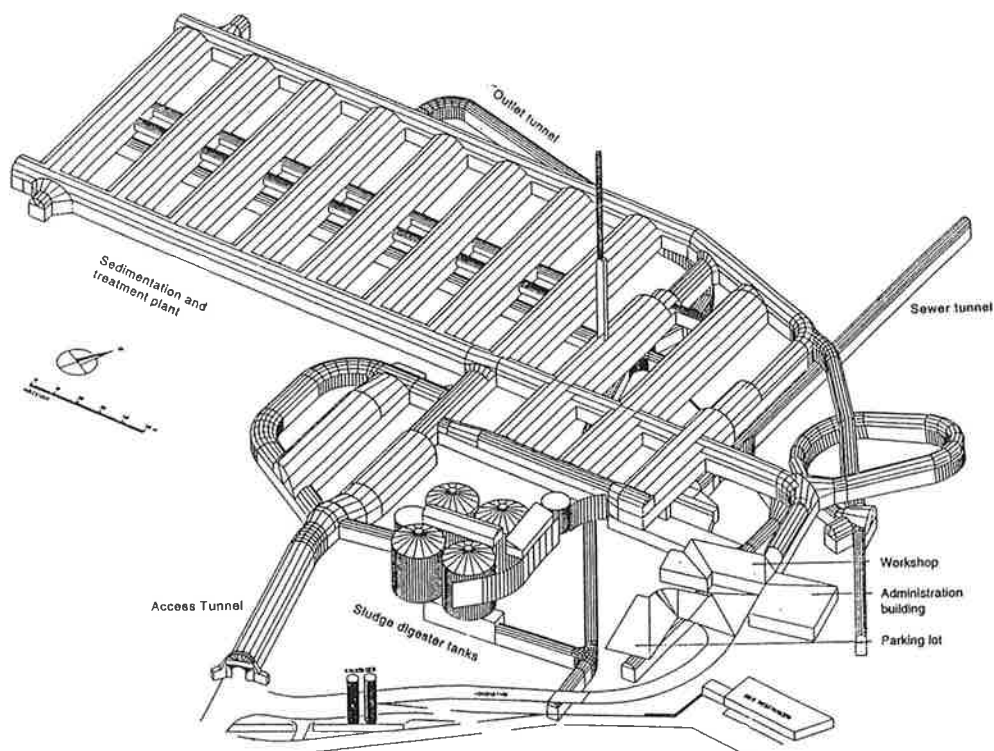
Layout of the VEAS waste water treatment plant. From [1]
